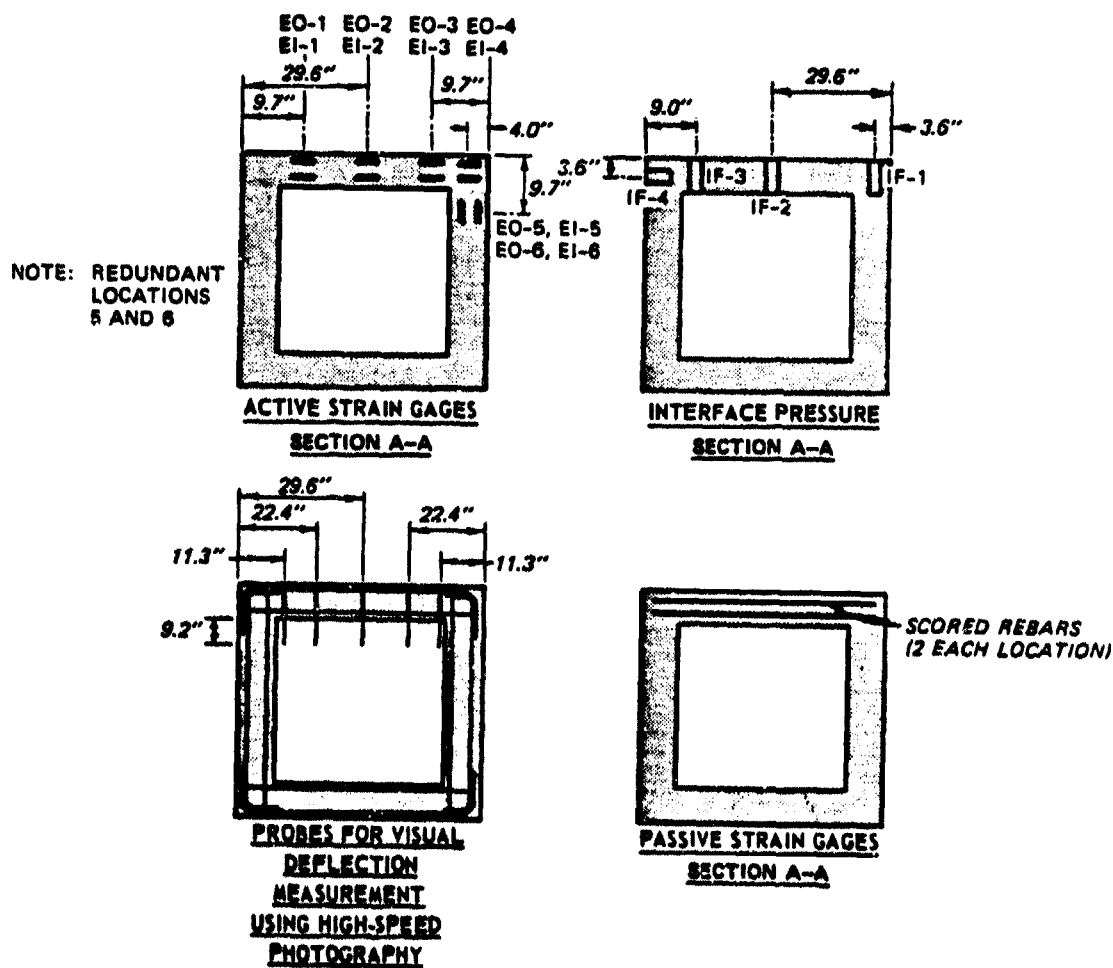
Example Test Instrumentation Layout, Test Groups II & III (Kiger'82)
